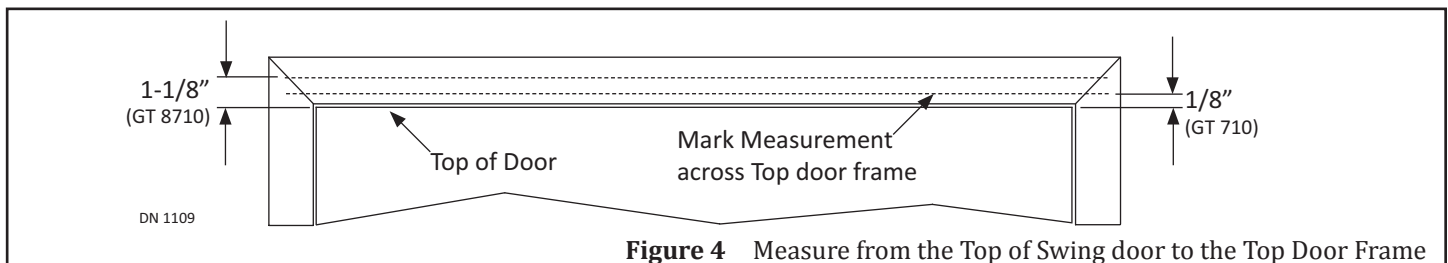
Measure from the Top of Swing door to the Top Door Frame
